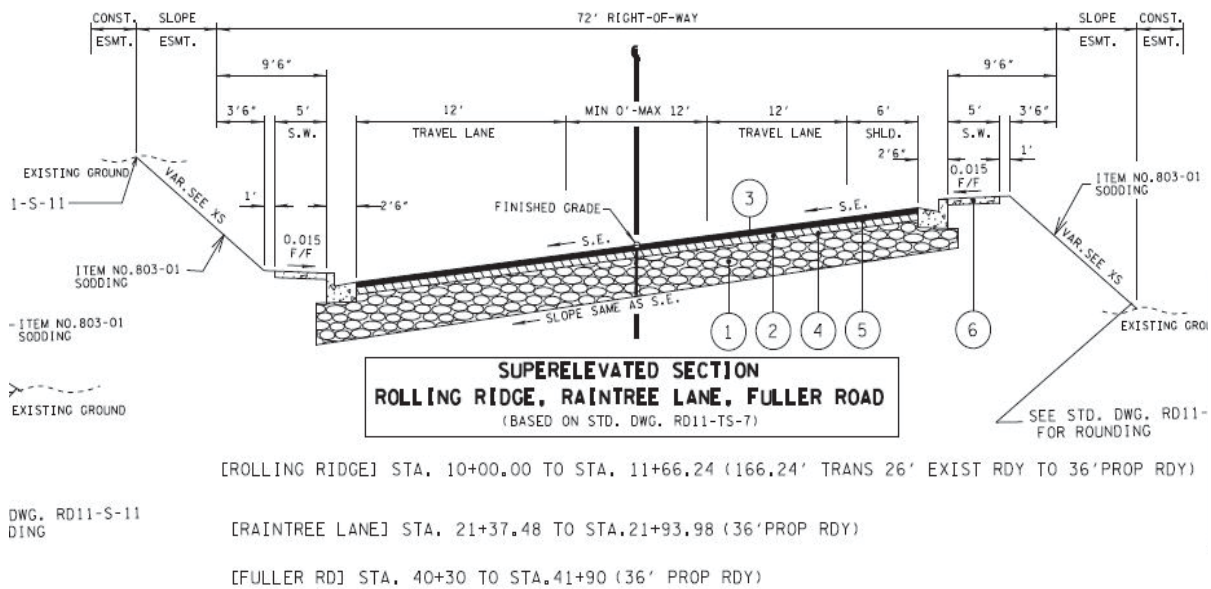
Typical Section of Rolling Ridge Drive, Raintree Lane and Fuller Road near SR-320 (05/12/2020 ROW Field Review Plans, Sheet 2B4)
